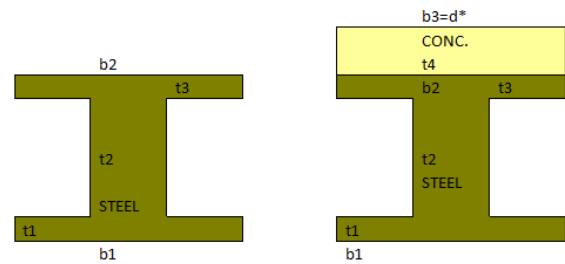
Cross-Section of Beam and beam with concrete deck element.
